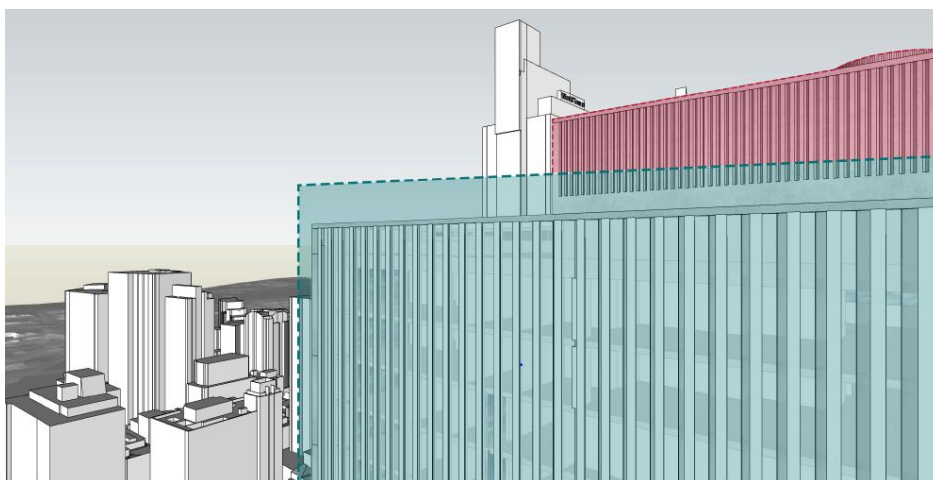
View F.1 - View perspective from apartment at Level 46, approved building envelope identified in blue, amended envelope outlined in red
